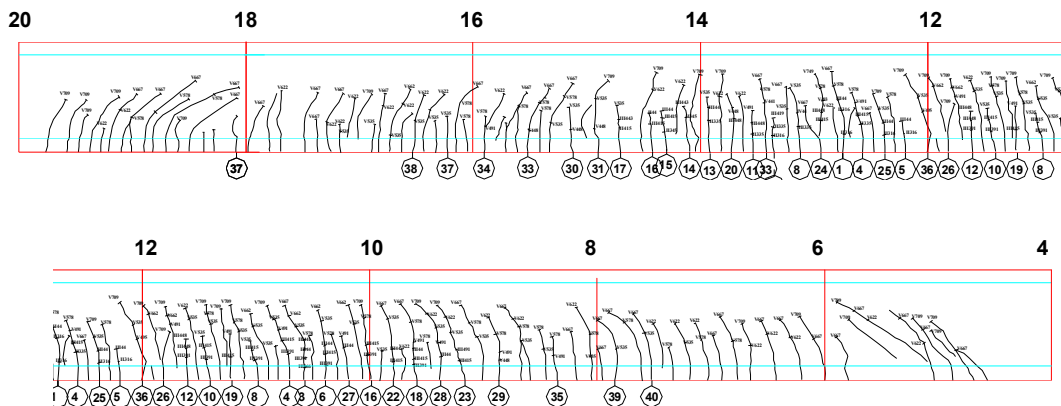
Cracking pattern (Section 12 is the mid-span of the T- beam)
